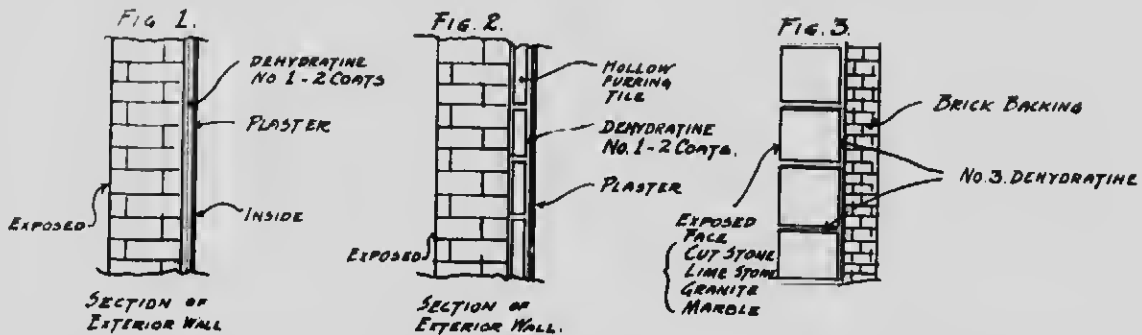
represents section with furring omitted, plastering being done directly upon the damp-proofing, while in Fig. No. 2, where Hollow Tile is employed, the use of No. 1 DEHYDRATINE between it and the plaster prevents staining of the latter.
